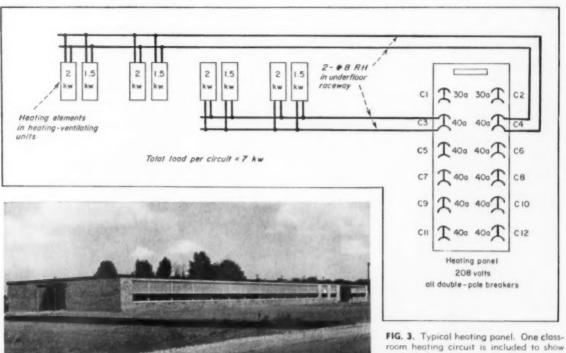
School is of masonry and glass block construction with flat, $2\frac{1}{2}$ -in,-thick planked roof. 2-in, perimeter insulation was installed completely around floor slab; walls and ceilings were insulated with 2-in. blocks of Foamglas 12 in, wide and 18 in, long. Portion completed measures approximately 85×220 ft.
